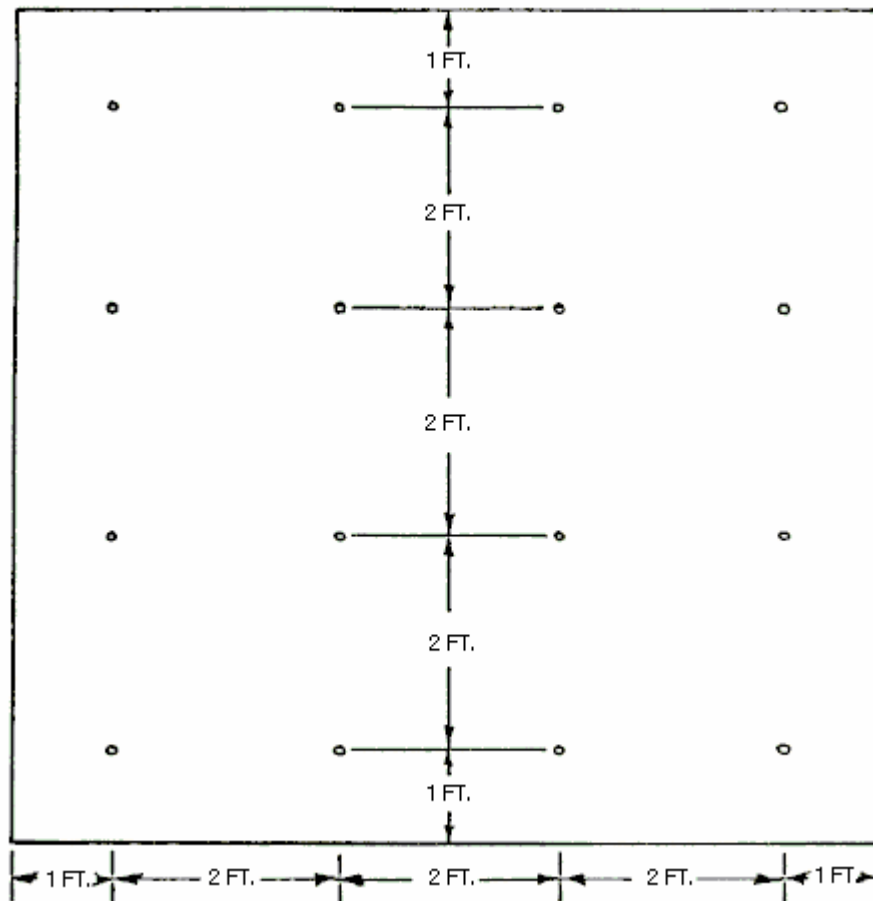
B-1-TYPICAL STEEL FRAME SUPPORT SYSTEM
